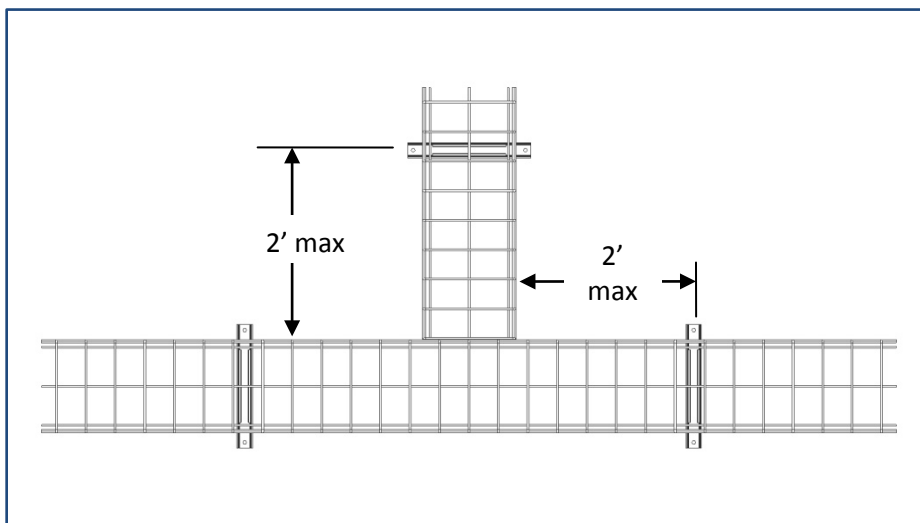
Support Recommendation for Horizontal Tee Intersections, Top View
